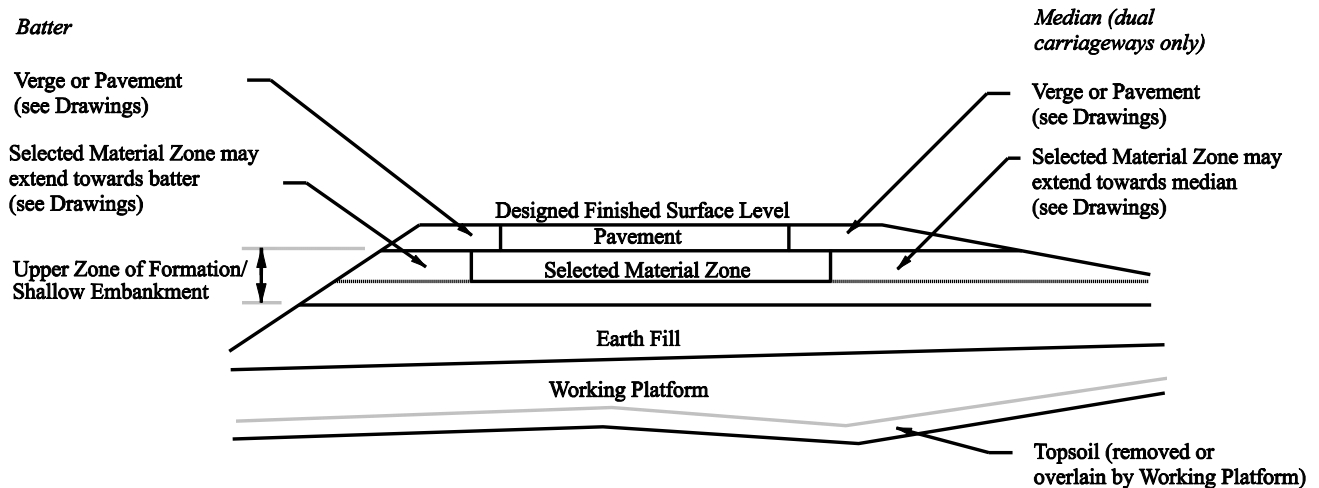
(c) – Embankment Foundation Treatment – Type E3
